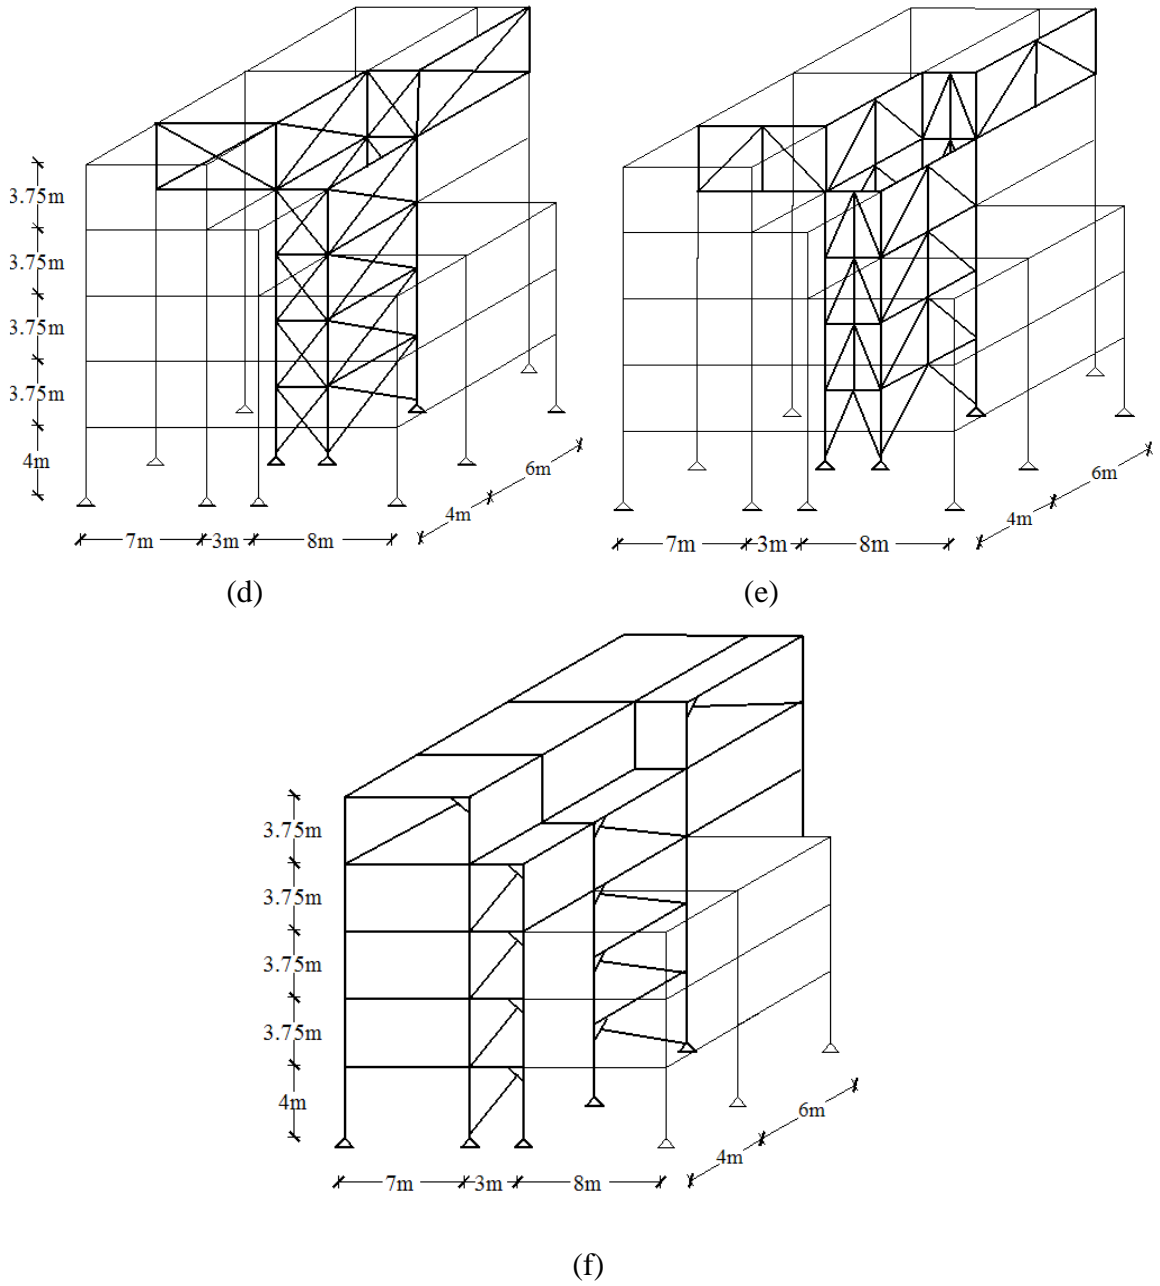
Asymmetrical Plan and Section core (d) cross (e) zipper (f) knee bracings.
